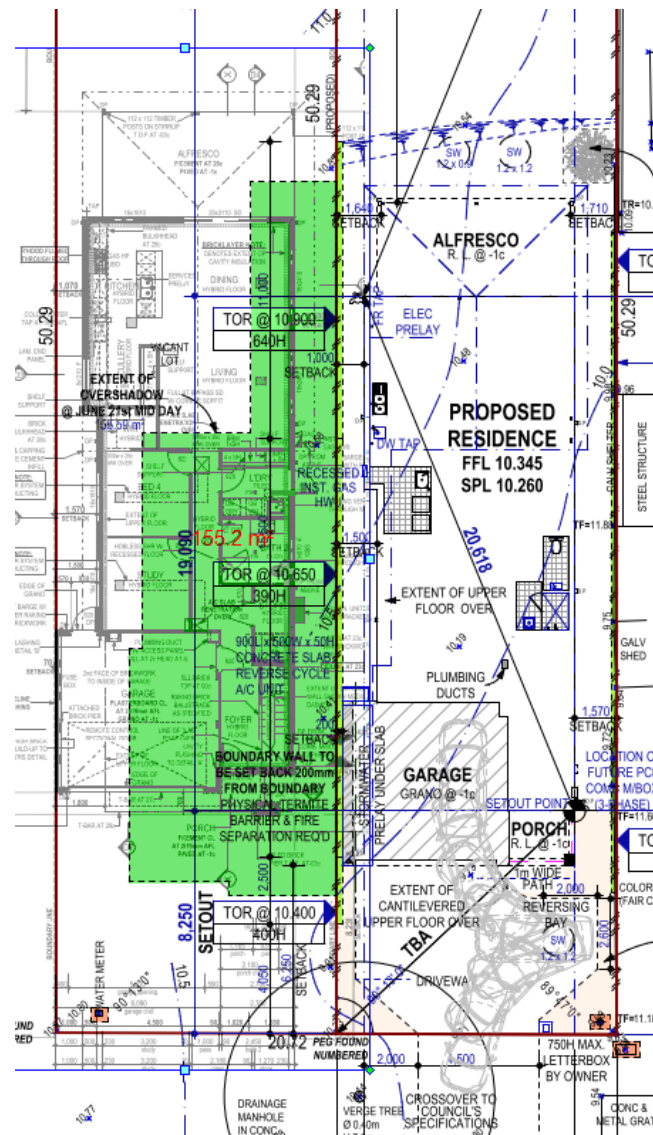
Shows the maximum southern shadow generated (in green) onto the southern affected lot approved ground floor plan.
